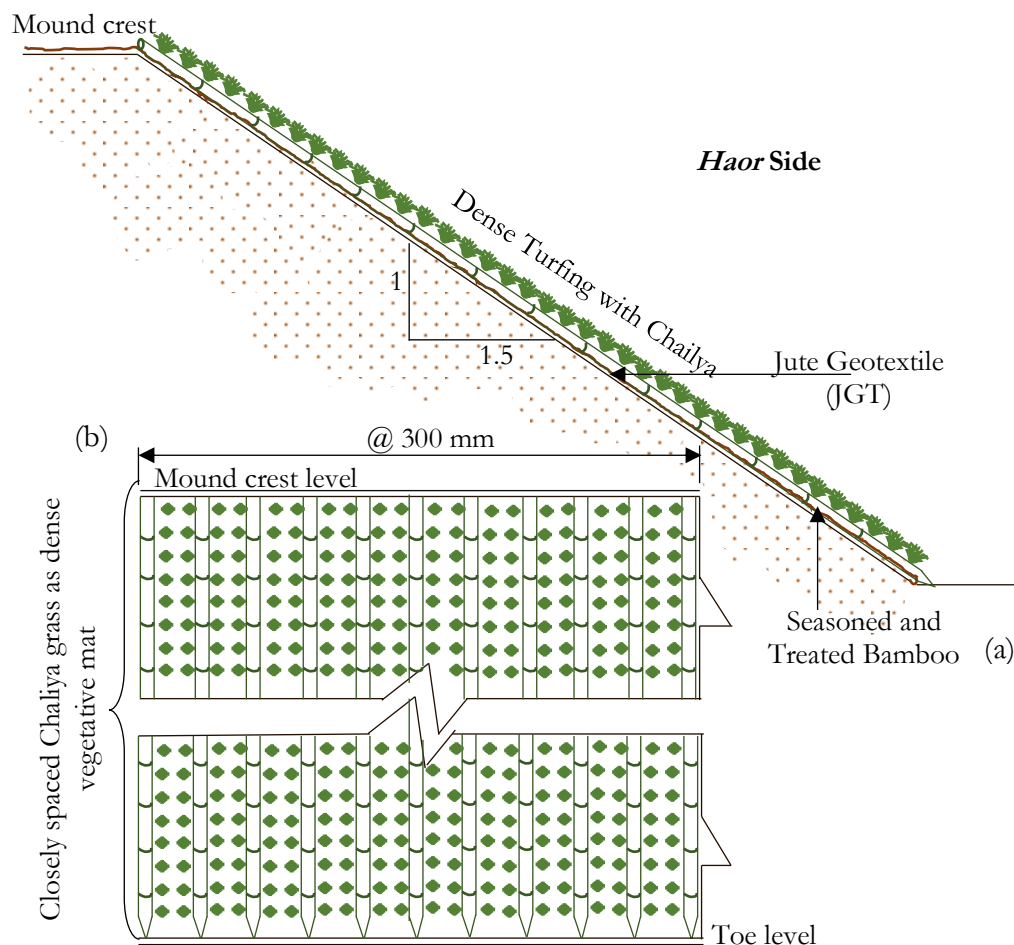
Schematic Drawing of Design Type I, (a) Cross Sectional View; and (b) Plan View (Redrawn from HILIP, 2017)
